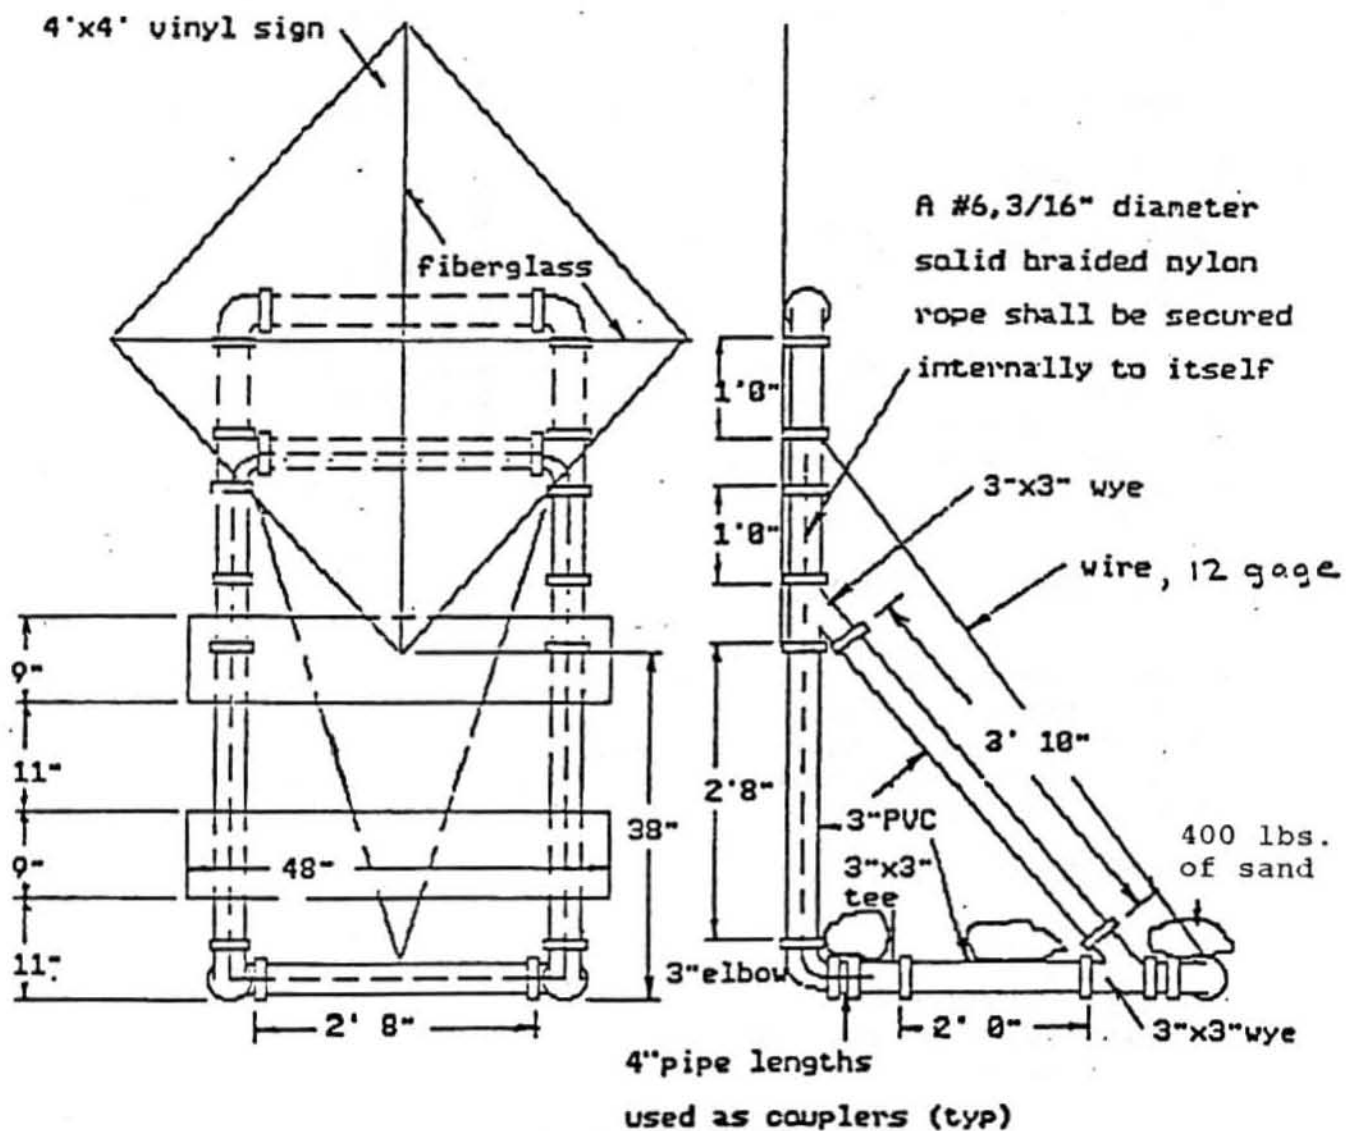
Breakaway Barricade For Test No. 9 and Test No. 10
